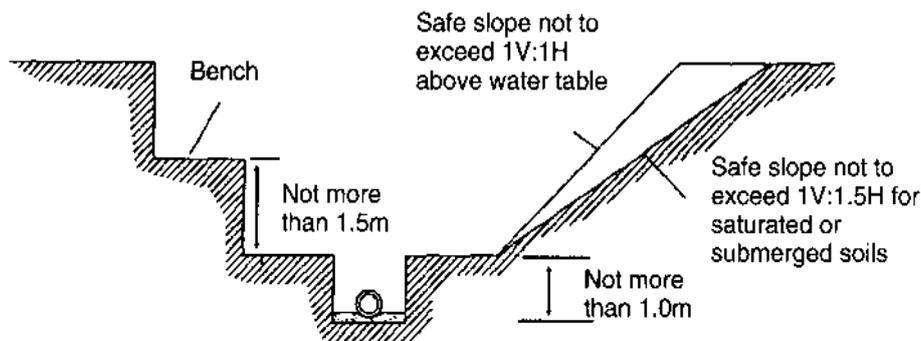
Excavation Face Benched and Battered to a Safe Slope
